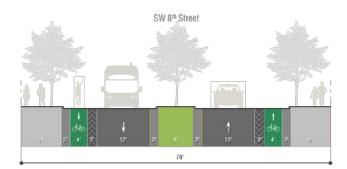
Build Scenario 2 (2-Way Alternative 3) Typical Section
